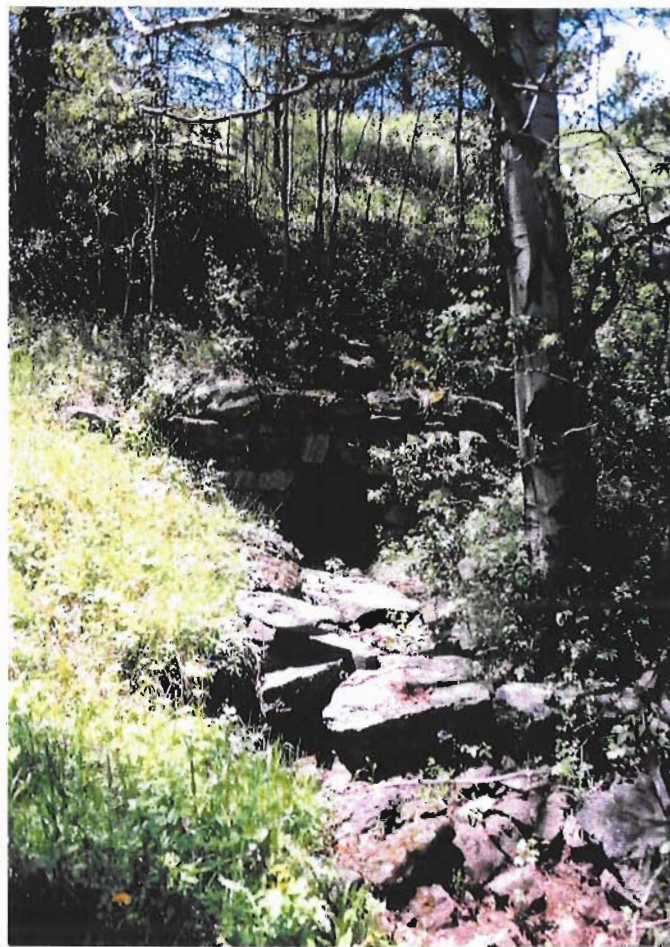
View of Drain Through Railroad Grade, Site 39LA2000, Looking West.
